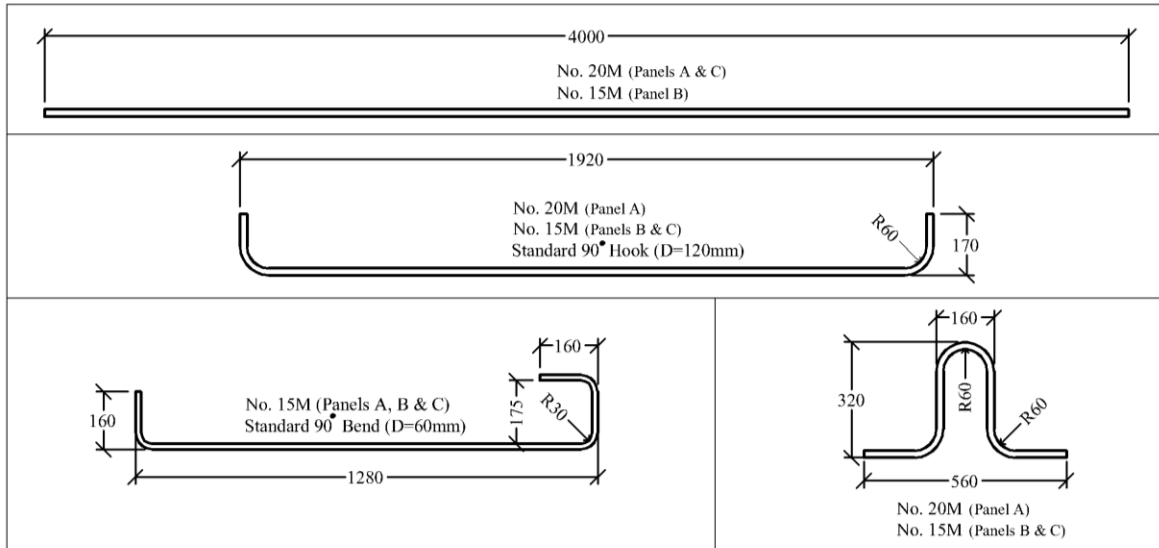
Detailing of reinforcing bars used in RC panels
